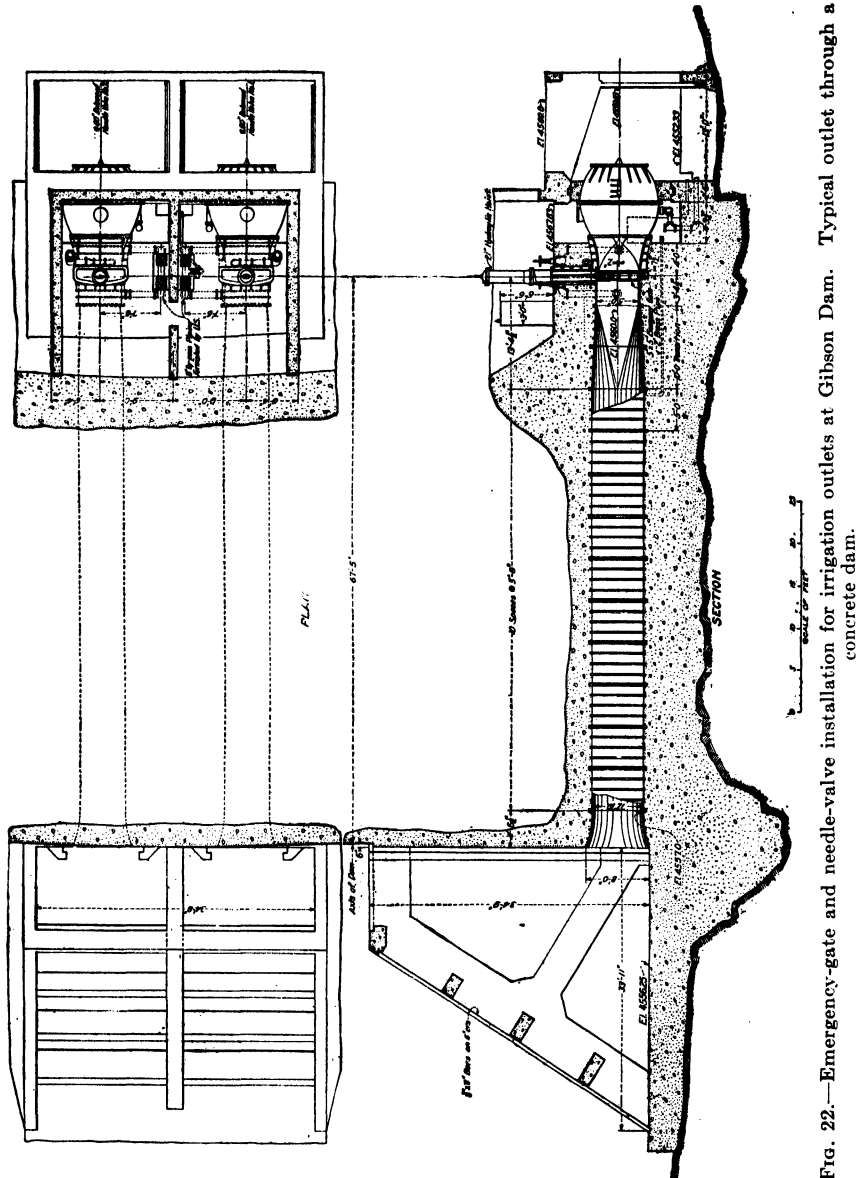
Emergency-gate and needle-valve installation for irrigation outlets at Gibson Dam. Typical outlet through a concrete dam.
